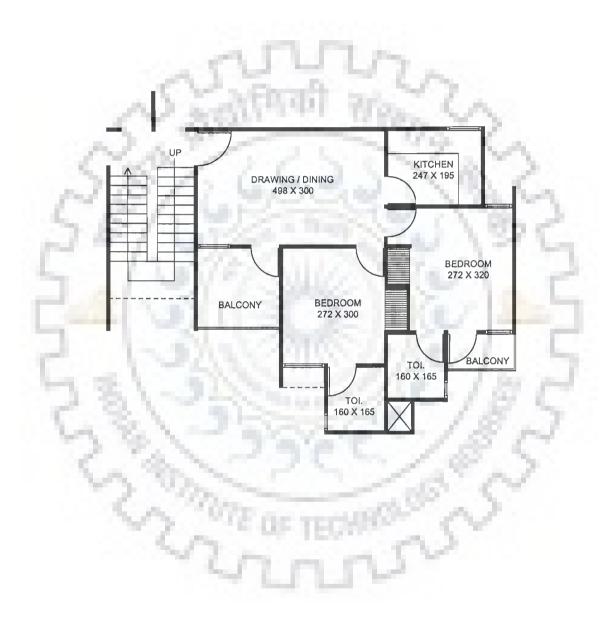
(b) - Typical Floor Plan of Type II, Project No. 16 (Plinth Area of One Dwelling = 66.00 sqm; Floor Area of One Dwelling = 55.40 sqm)
